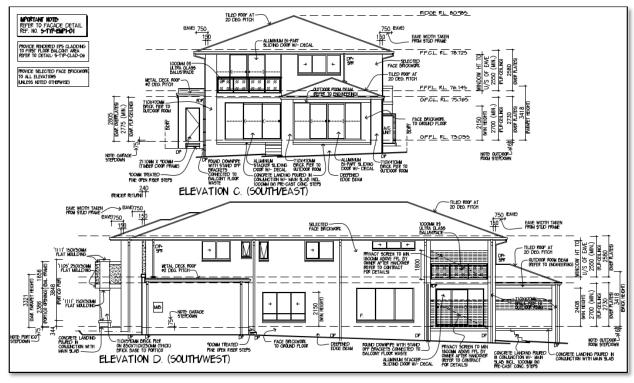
Proposed rear (South-East) and side (South-west) elevations.
